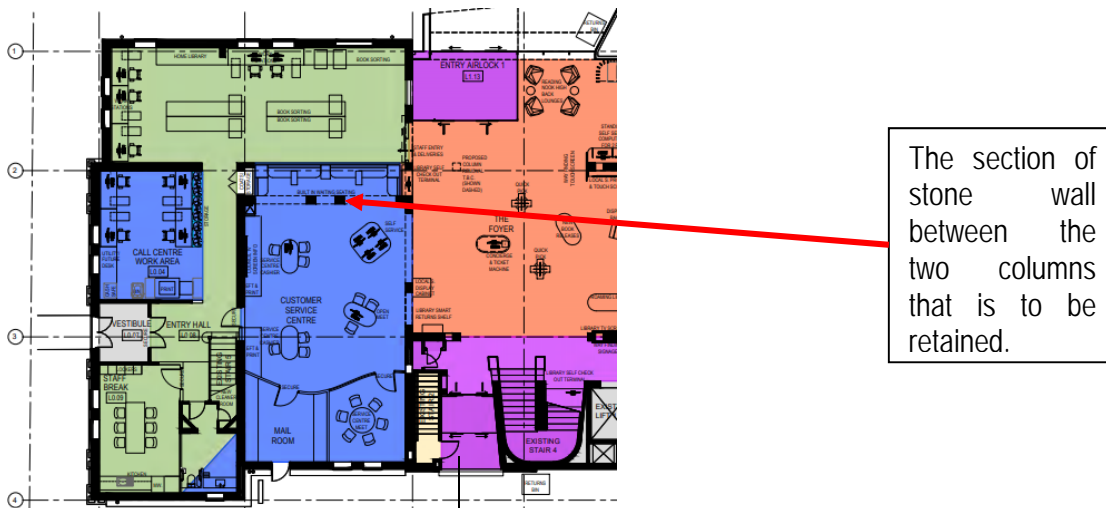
Plan no. LB-LO-DA02 Library Ground Floor General Arrangement Plan
